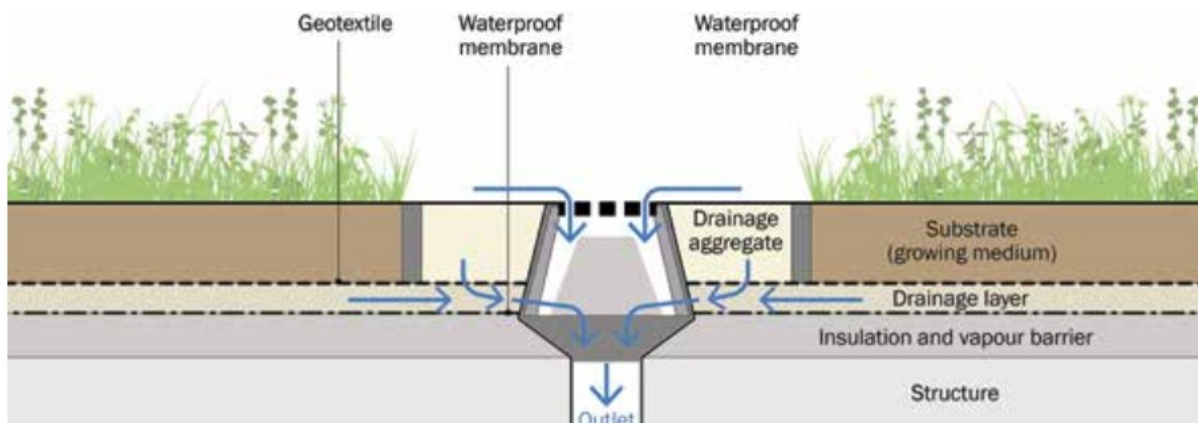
Typical Green Roof detail with outlet (SuDS Manual Figure 12.14)
